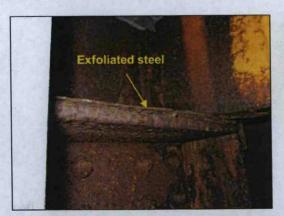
Roof column-beam connection at Location 1 with pitted and exfoliated steel.
